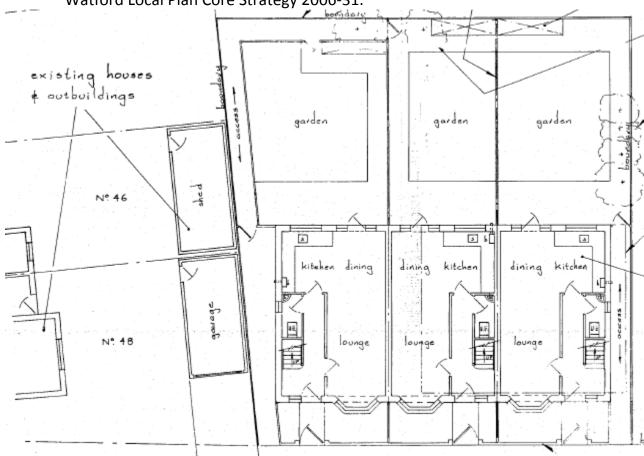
Refused site plan for planning application 14/00170/FUL.
